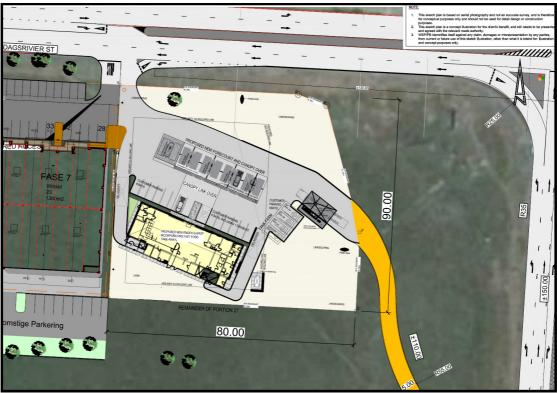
Layout Plan No 1 indicating the filling station and access road (taken from Kotze, 2017)
